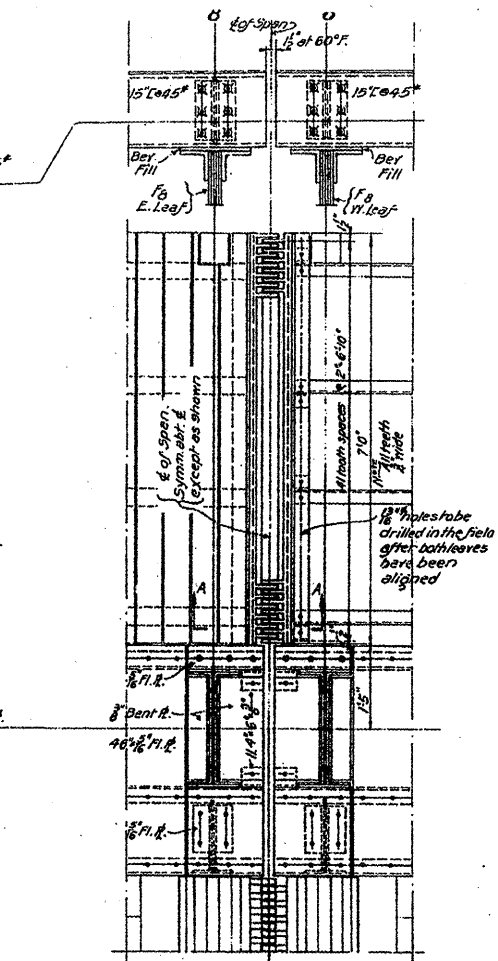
DETAILS AT REAR BREAK IN SIDEWALK FLOOR - NORTH SIDE OF WEST ABUTMENT
